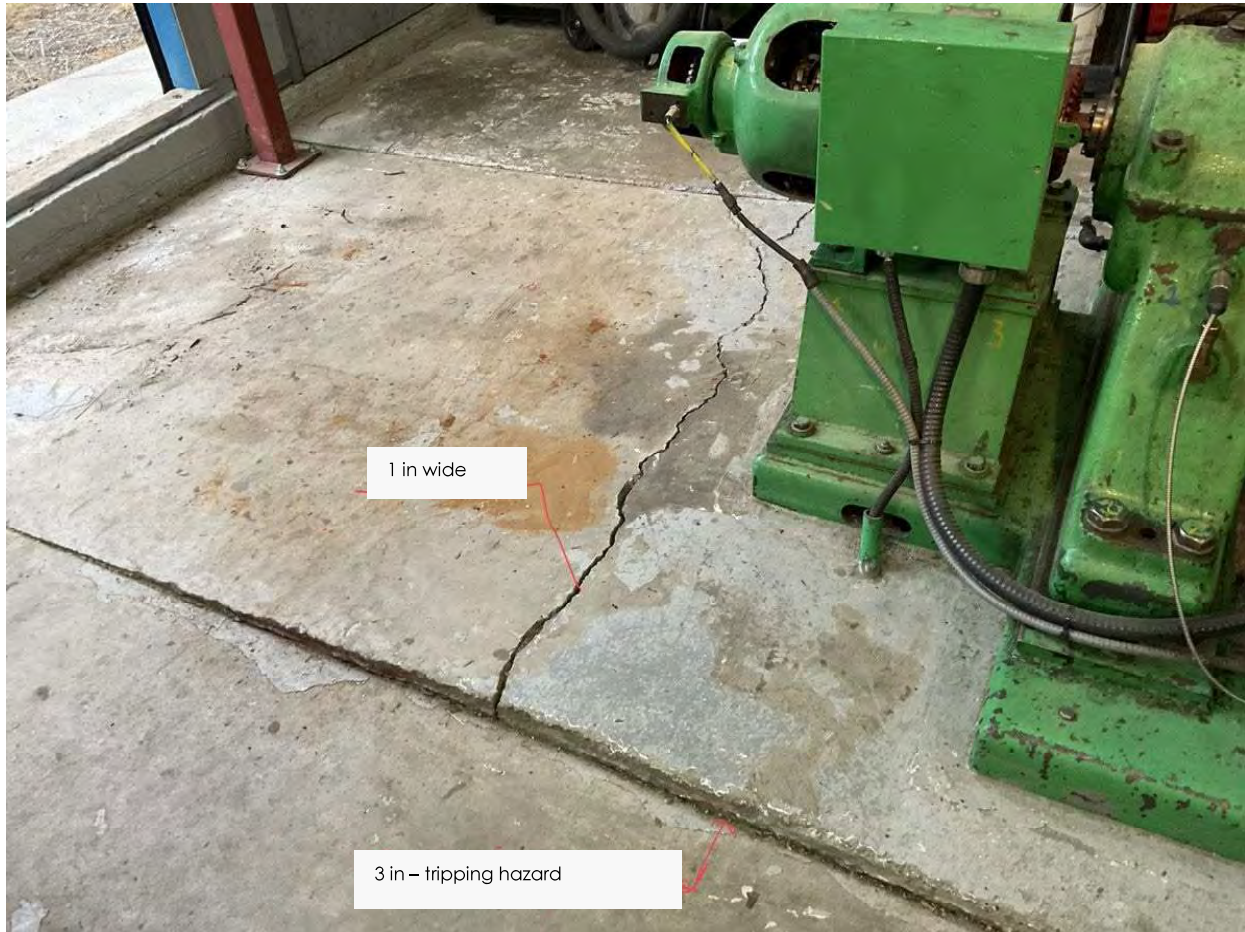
1 in wide crack on the floor and settlement between the block concrete and building slab
